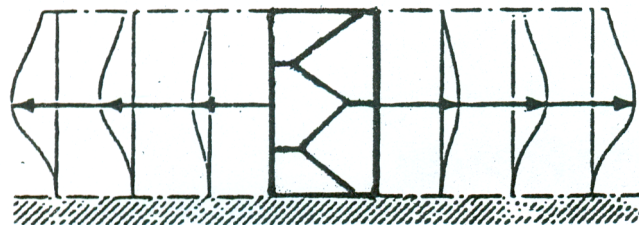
Effect of central stairwell on surrounding columns (no expansion joint)
